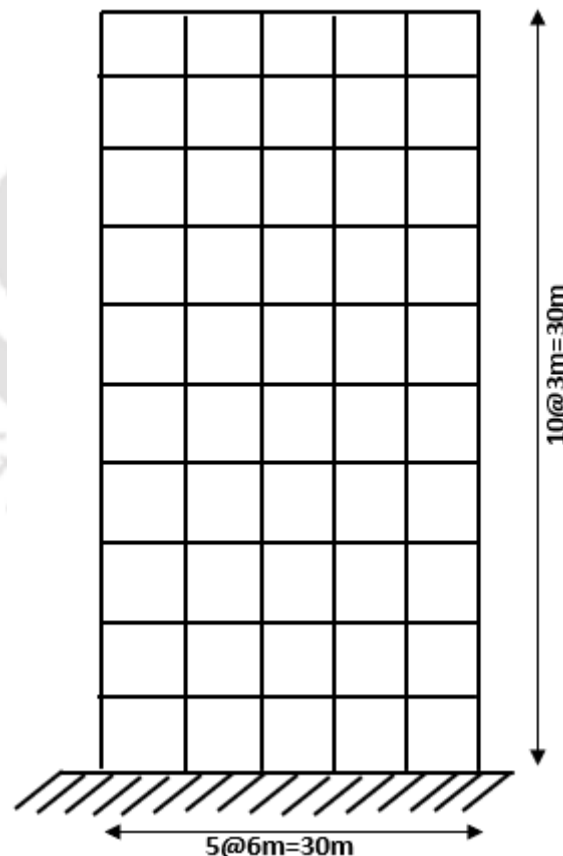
RC 10-storey, 5-bay multi-storey building.
